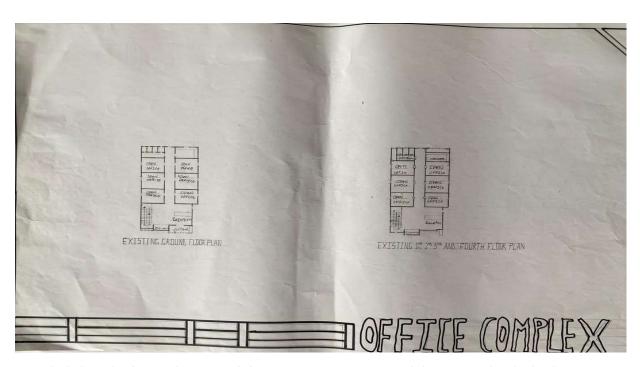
SHOWING THE FLOOR AND THE UPPER FLOOR PLAN OF CASE STUDY
